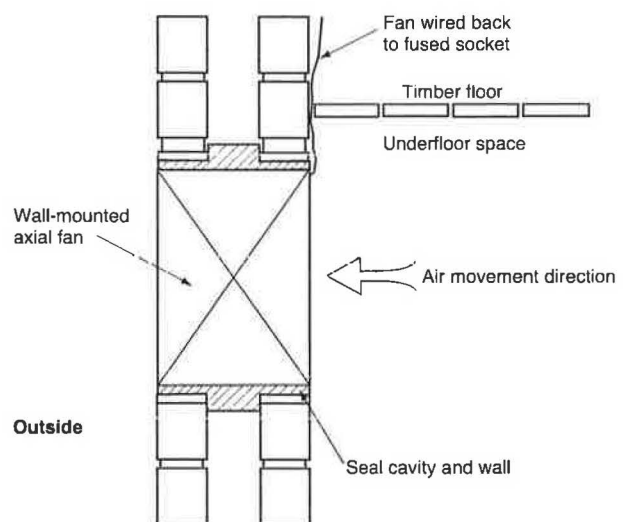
Mechanical extract ventilation with a wall-mounted axial fan
